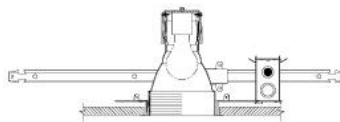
Incandescent lamp downlight showing housing, mounting, reflector, wiring, socket, and lamp.
